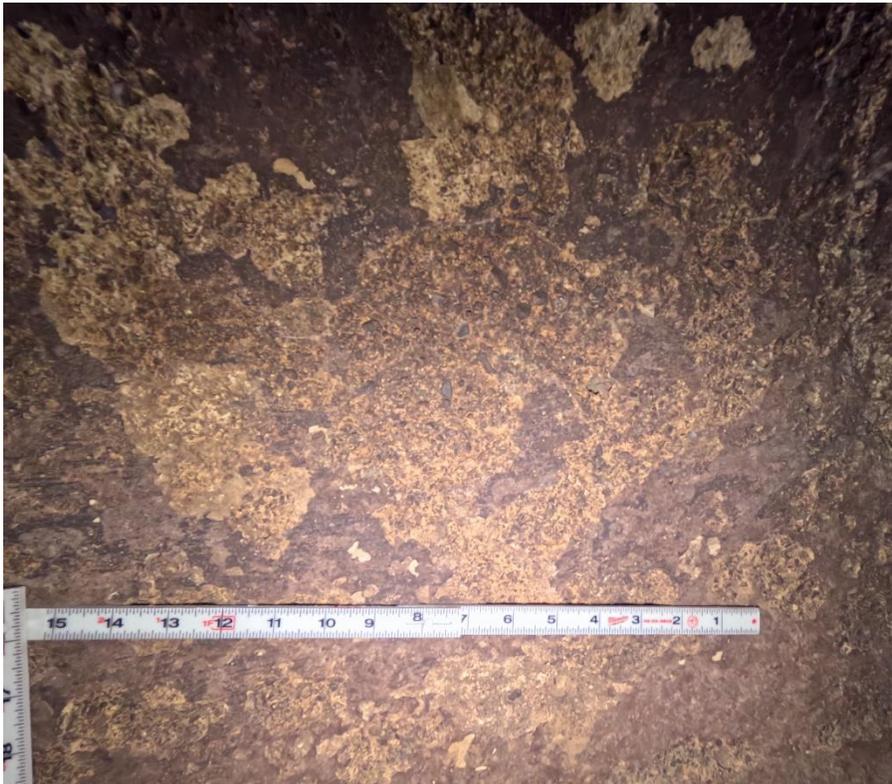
TYPICAL CONCRETE CONDITION LOOKING NORTH
